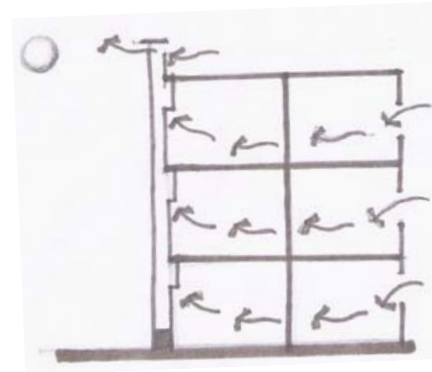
Natural Ventilation through fenestration facing wind and installation air-sucking canal on the side with the maximum sun rays
